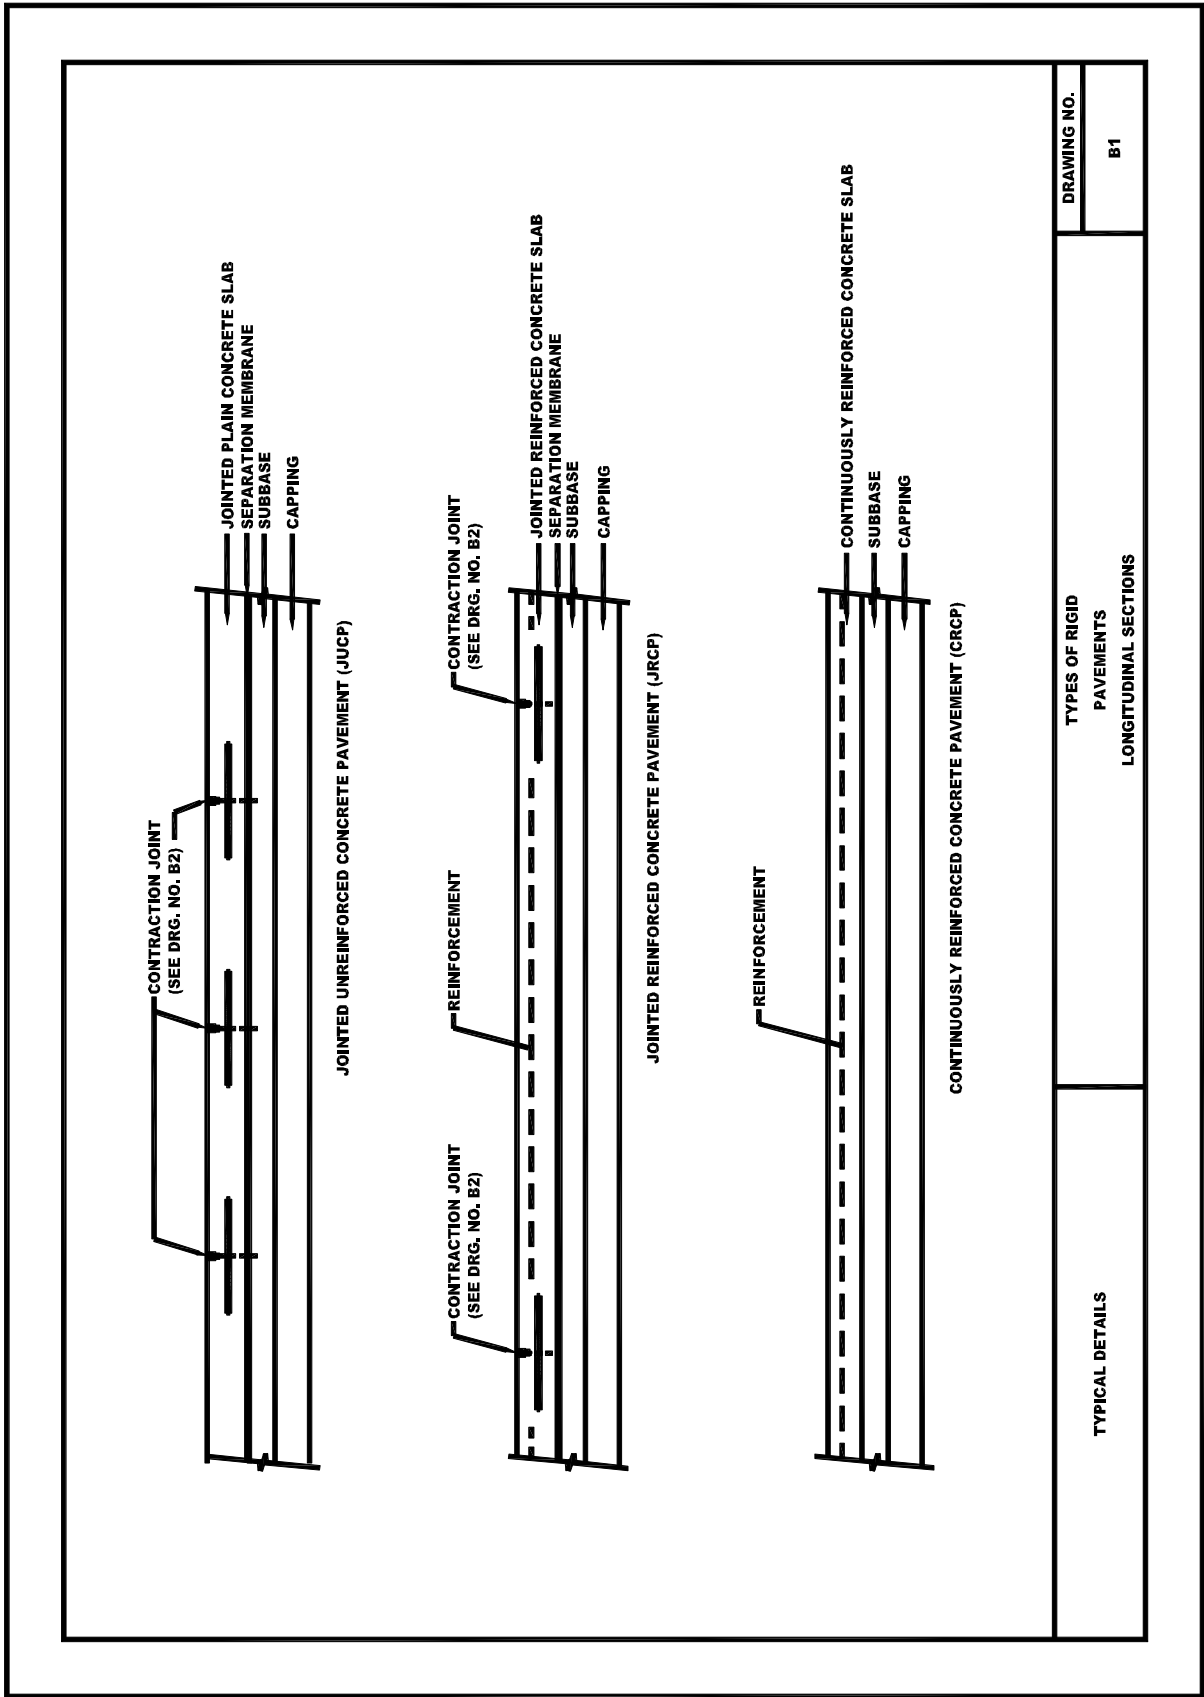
TYPICAL JOINTS IN CONCRETE ROAD PAVEMENT
